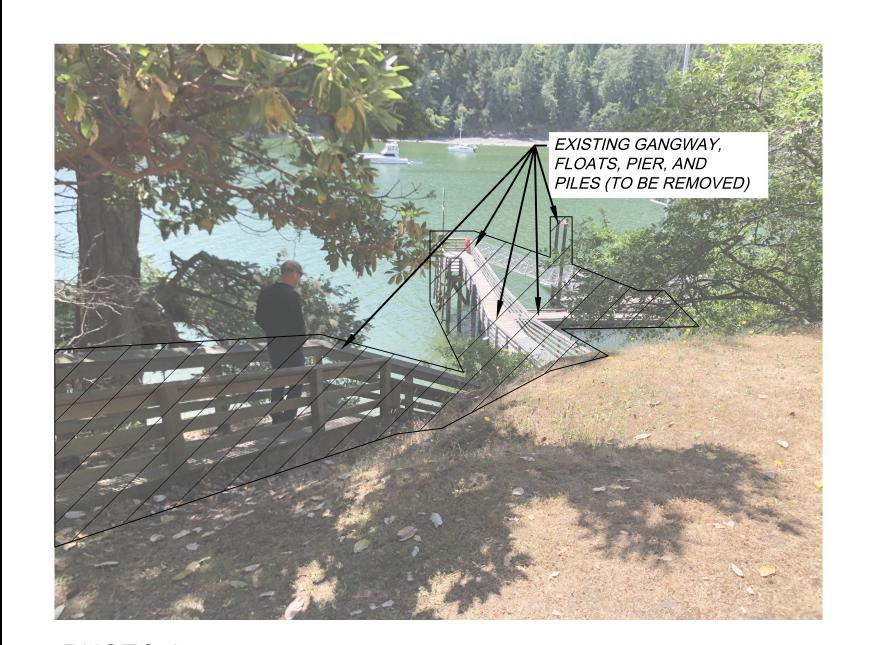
EXISTING MOORAGE FACILITY STAIRWAY AND TIMBER PIER - LOOKING SOUTHWEST
